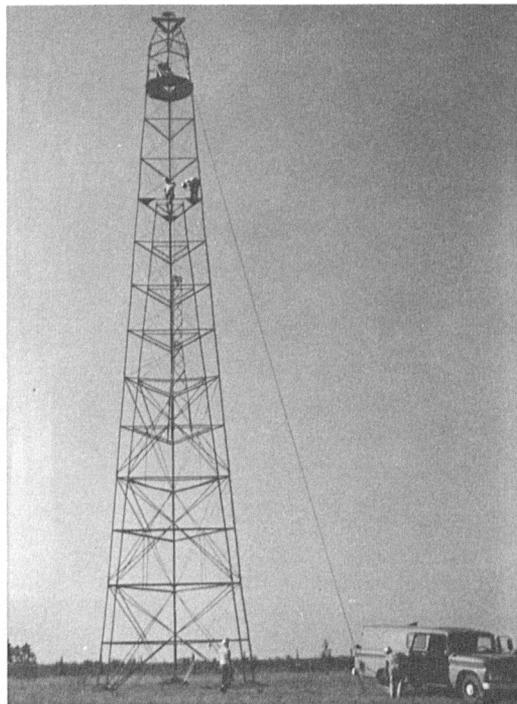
Hoisting the welded and built-up sections.
